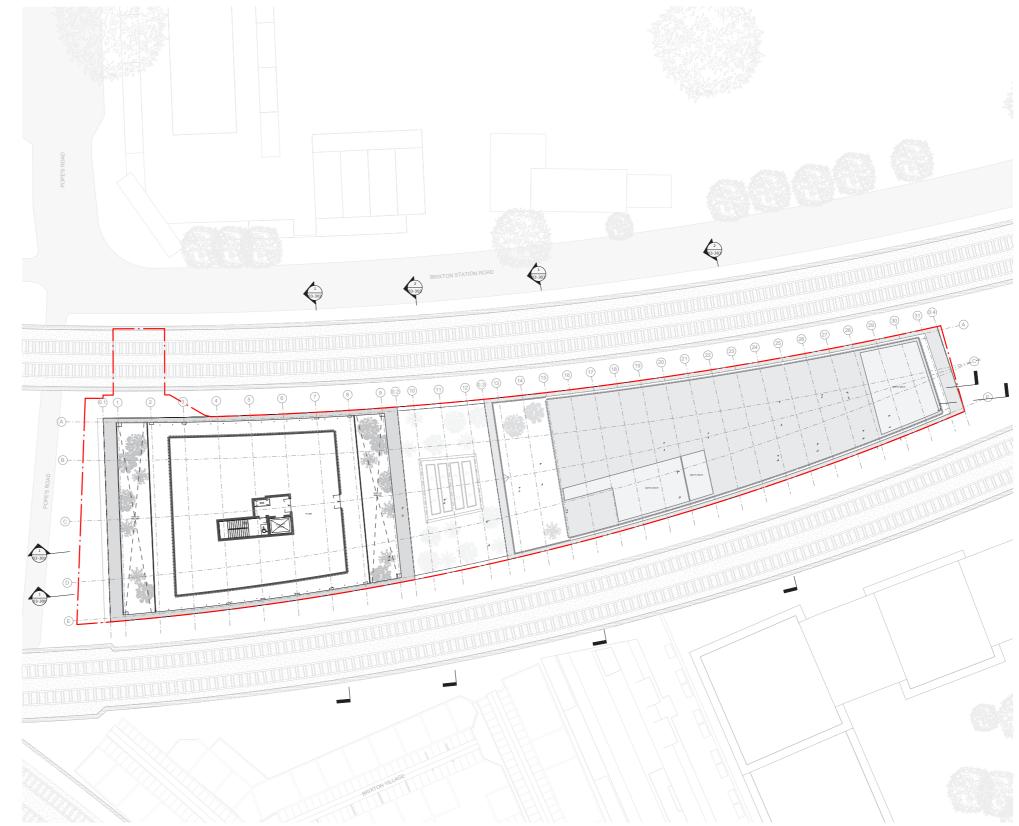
Fifteenth, seventeenth and nineteenth floor plan
